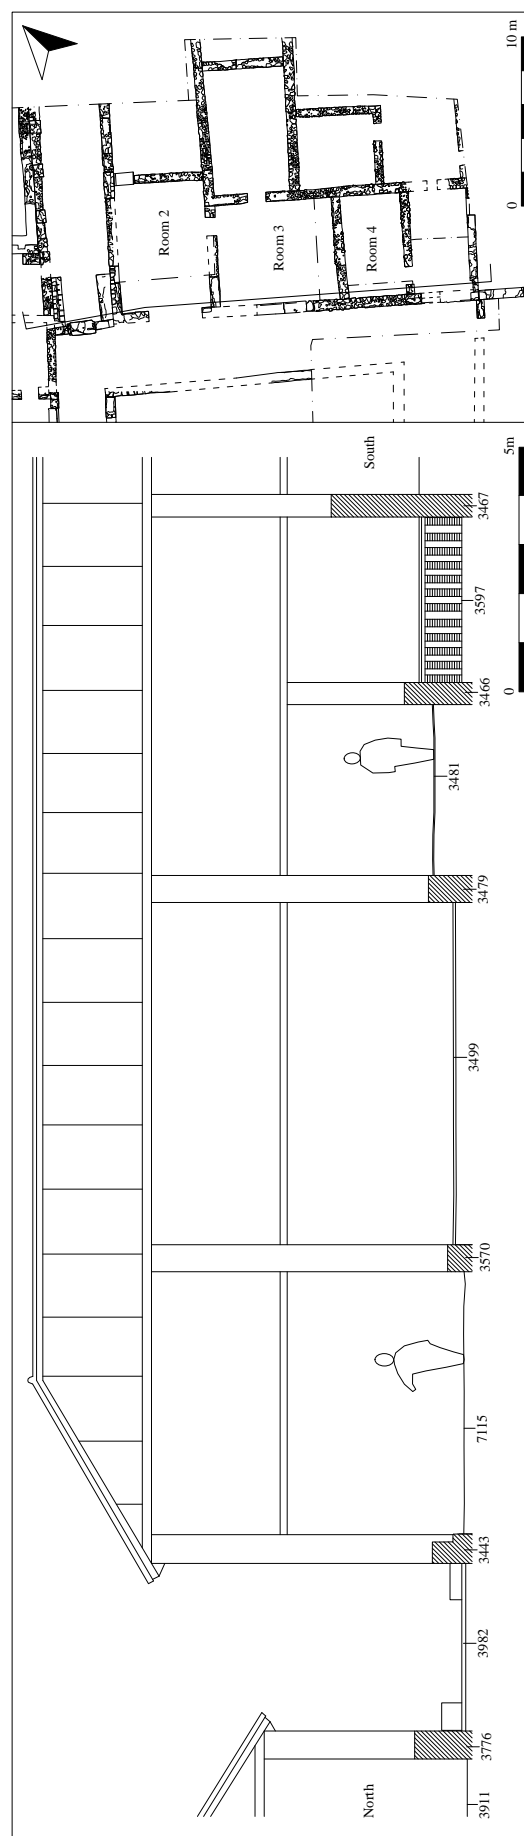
Reconstruction profile showing the different floor levels between Rooms 2, 3 and 4 of the east wing together with the eastern approach road
